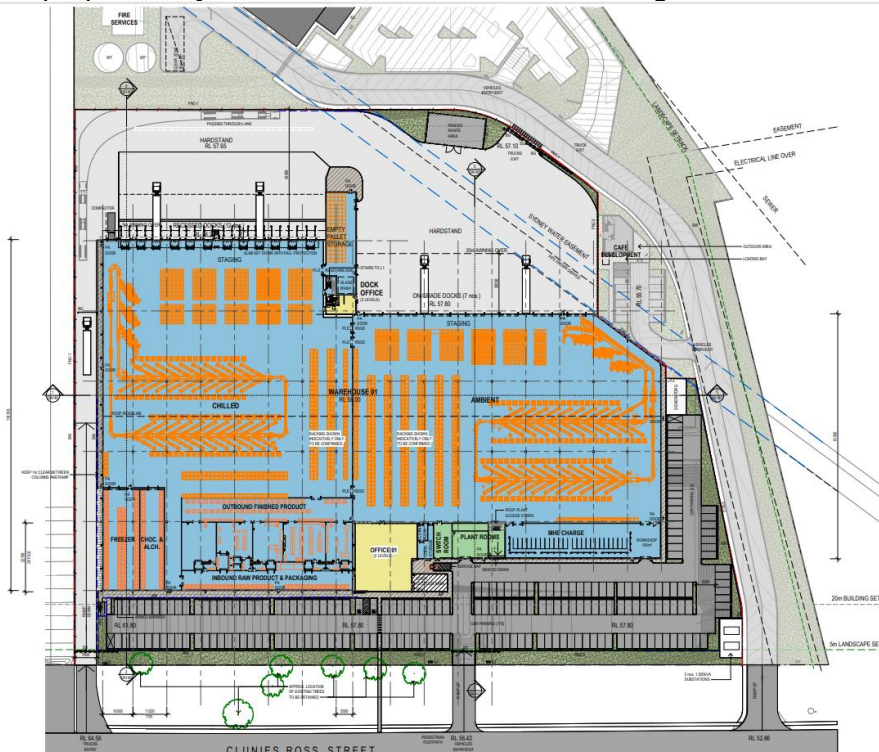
Proposed Warehouse 1 Site Plan (Source: Watson Young)
